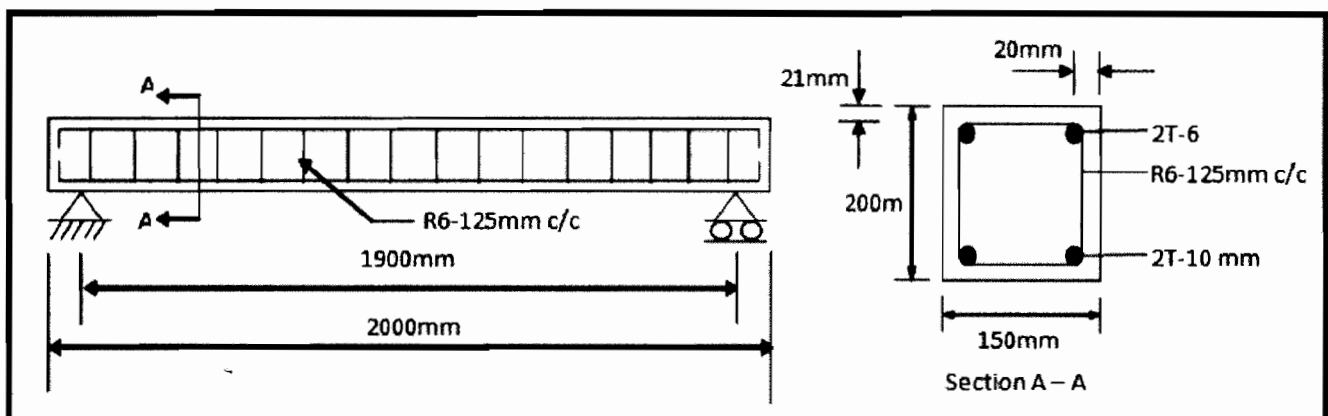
Longitudinal and Cross-Section Details of the Experimental Beams
